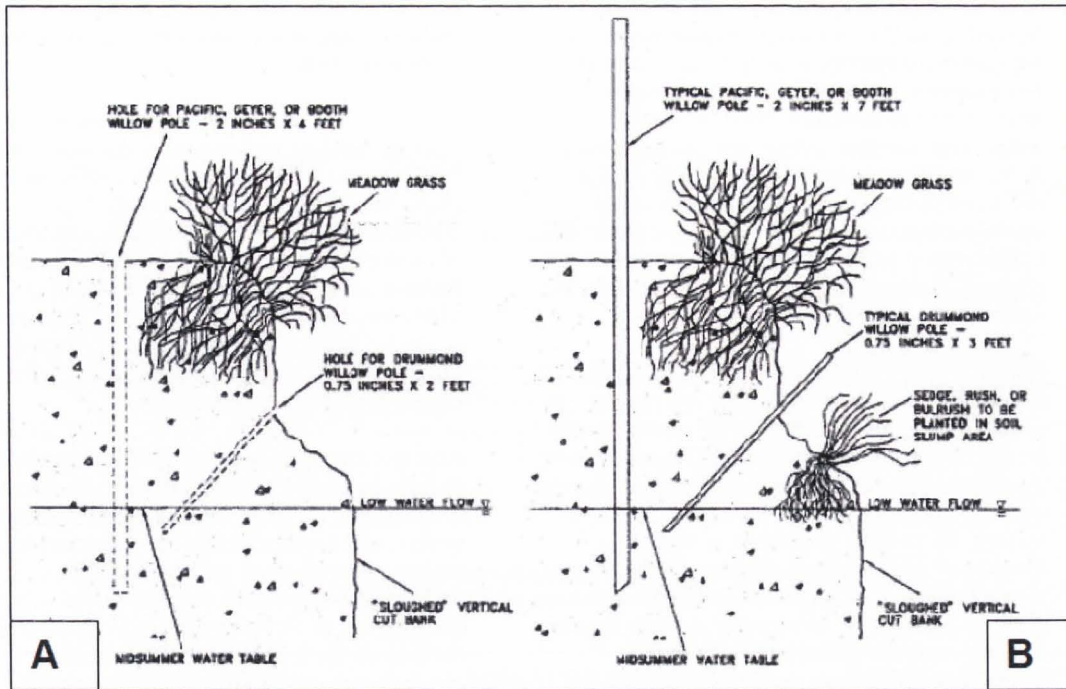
Typical planting details for placing dormant willow pole cuttings. Holes are drilled vertically or at a 45-degree angle into the streambank to a depth below the midsummer water table (A). Geyer and Pacific willow poles are planted on top of bank; Drummond willow poles are planted at an angle into the vertical outside bank, and herbaceous wetland plants are placed into soil slump areas (B) (adapted from RME, 1997).
